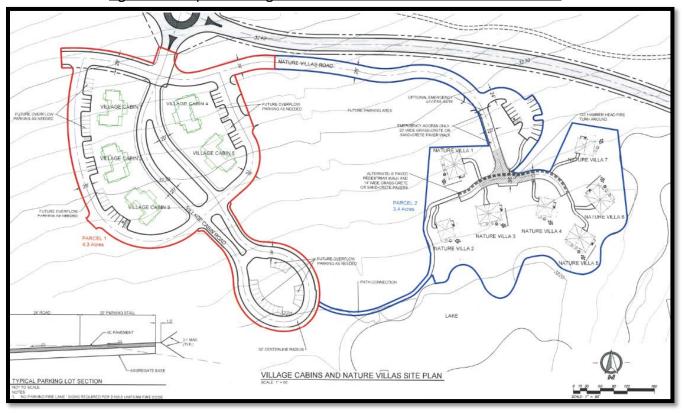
Proposed Golf Cabins OLU Site Plan Detail 8
